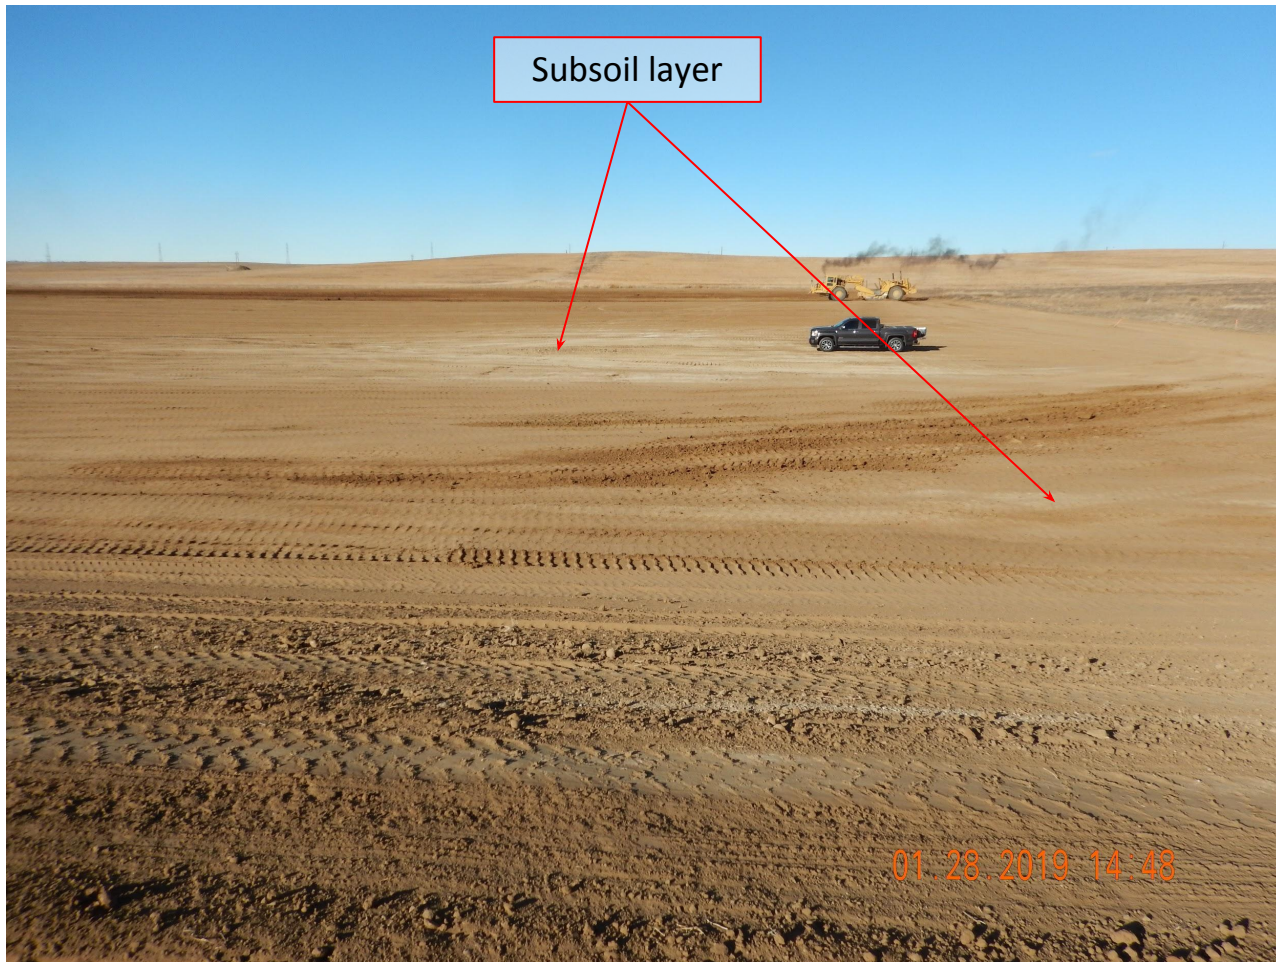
Photo taken from the topsoil stockpile, facing North. Photo illustrates the subsoil layer coloration indicating that topsoil has been salvaged to the appropriate depth.
